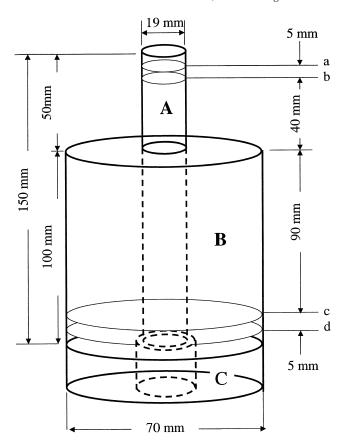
Configuration for measuring contact electrical resistance during shear loading of joint between steel rebar (A) and concrete (B). Steel support (C).
